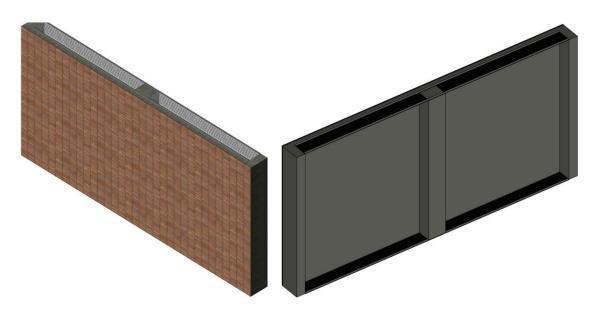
Redesigned Precast Panel (black indicates location of non-structural horizontal grating)
